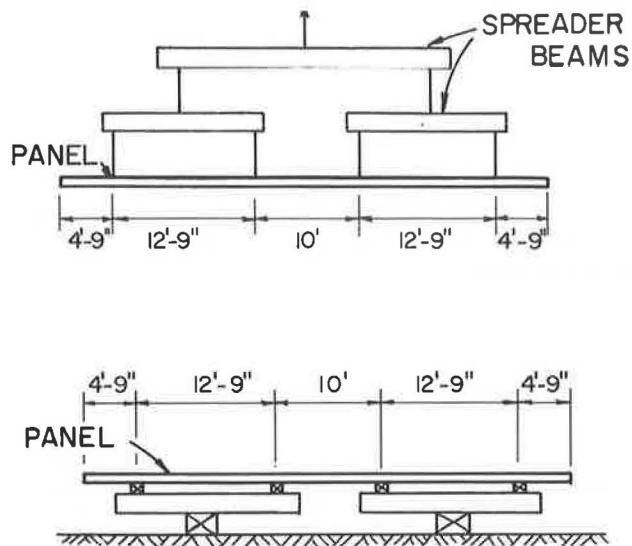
Top, four-point pickup and bottom, temporary support arrangements of precast panels.
